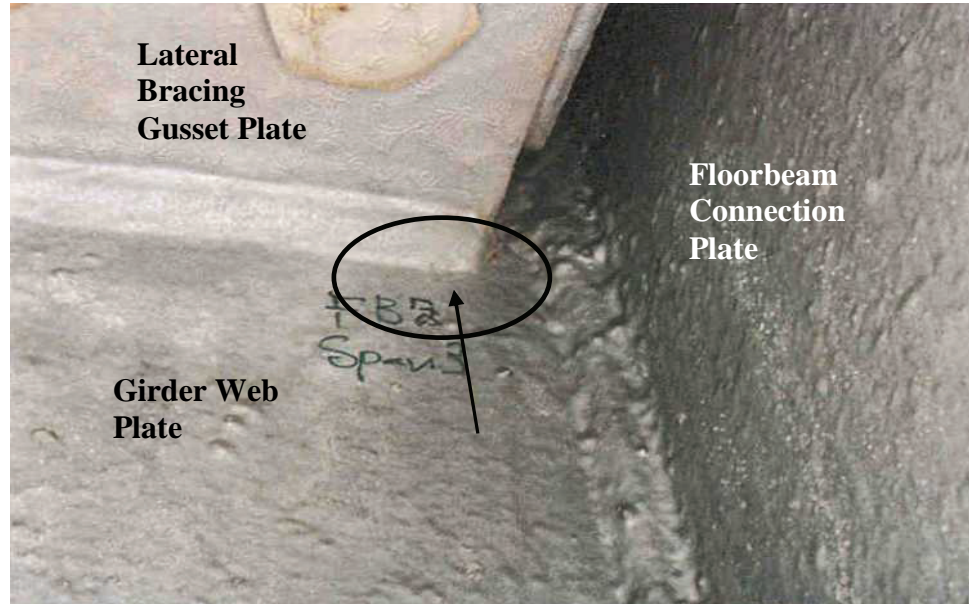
Crack Caused by Out-of-plane Distortion
